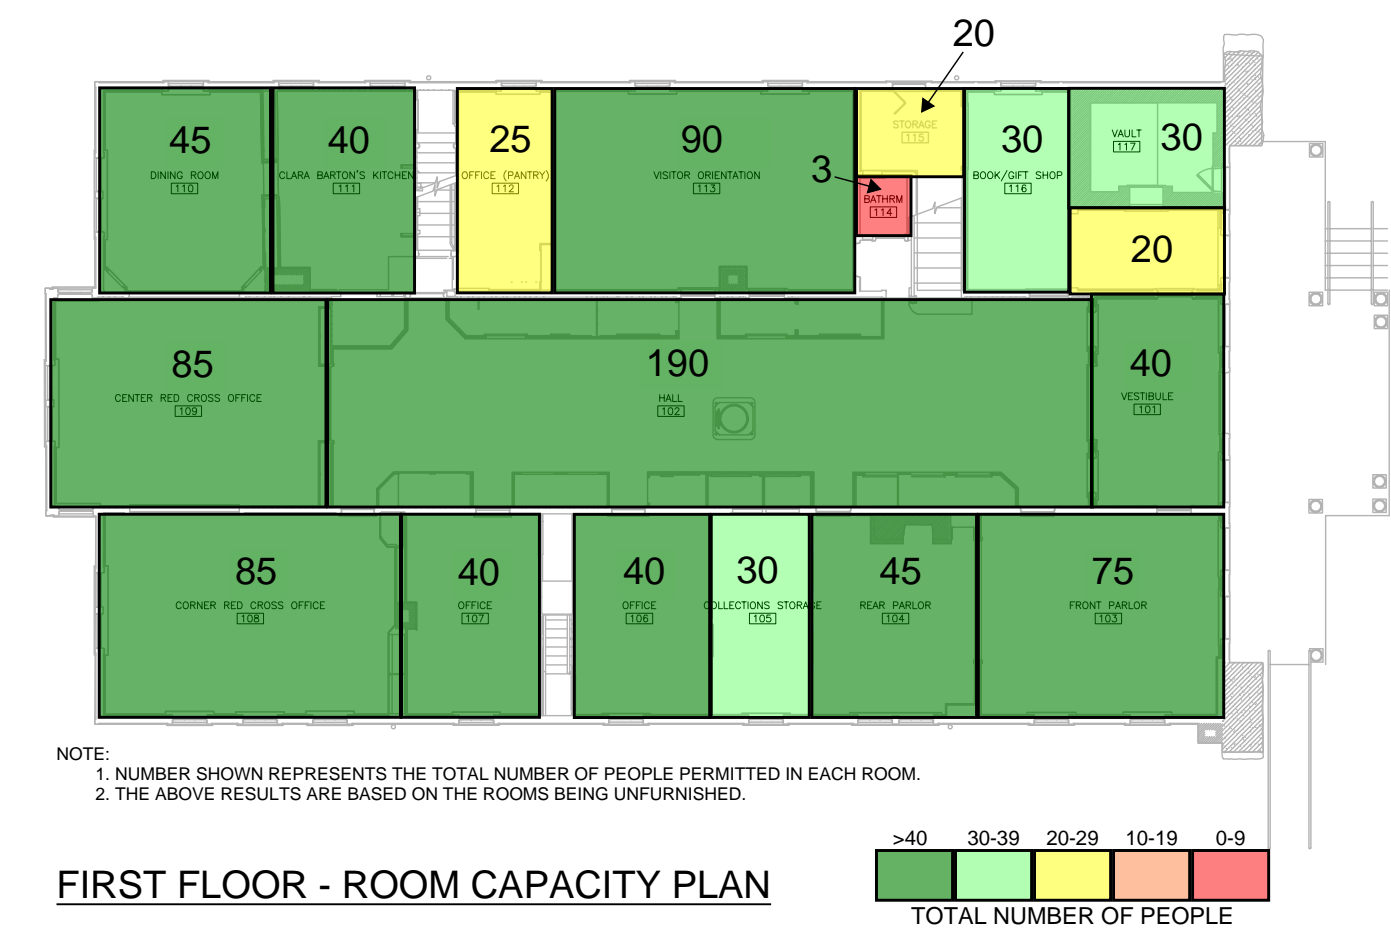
Unfurnished Room Capacity Plan - First Floor
